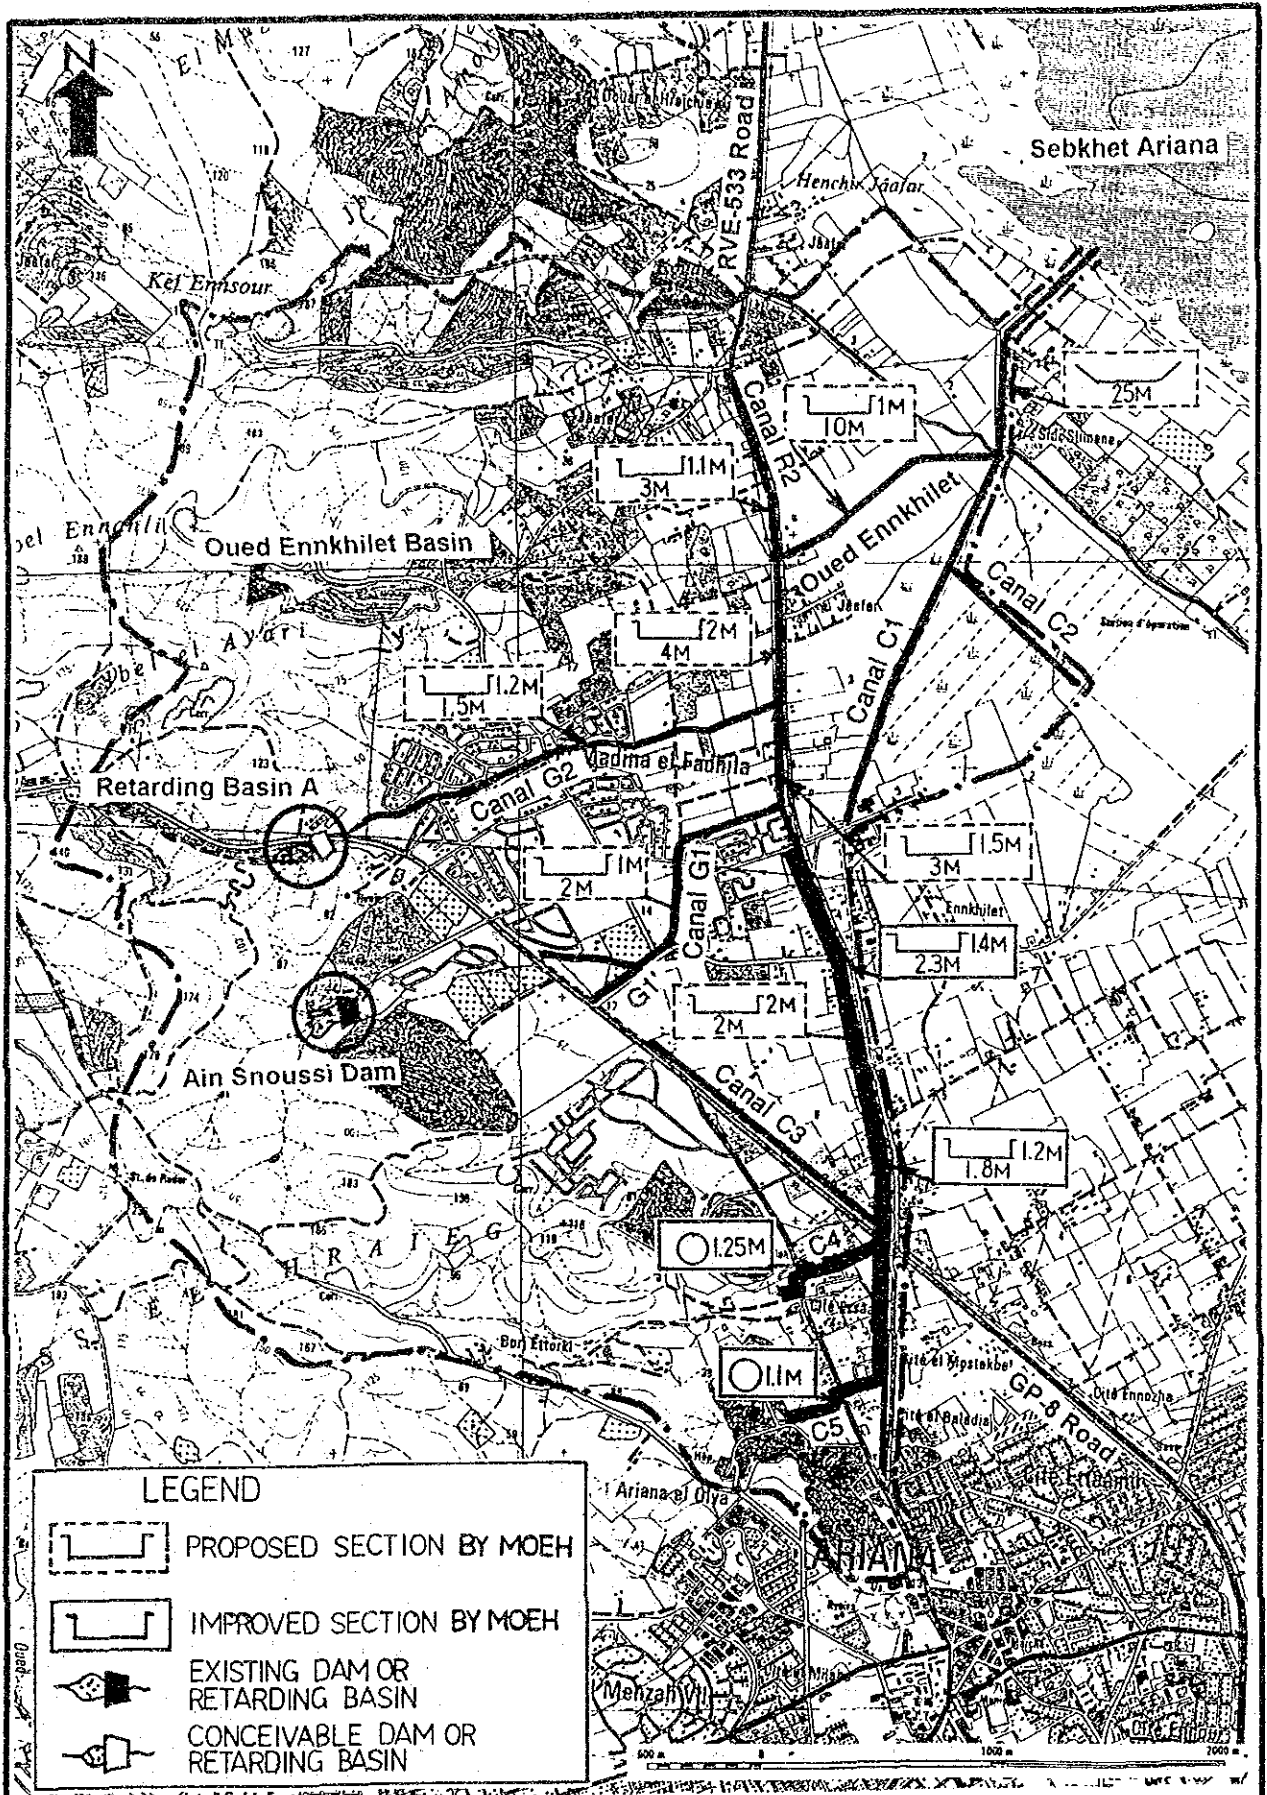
Existing and Proposed River Facilities in Oued Ennkhilet
